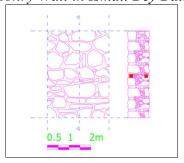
Wall Section-Timber Beam Hole, İsmail Bey Bath, İznik
